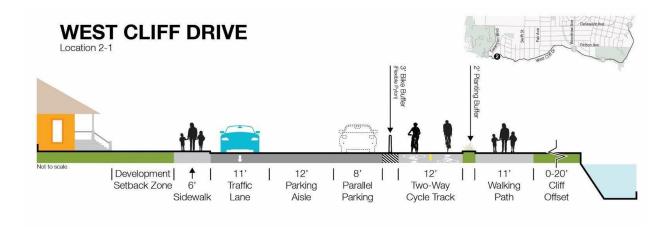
Alternative 2 Concept- Cross Section of Pyramid Beach parking lot
